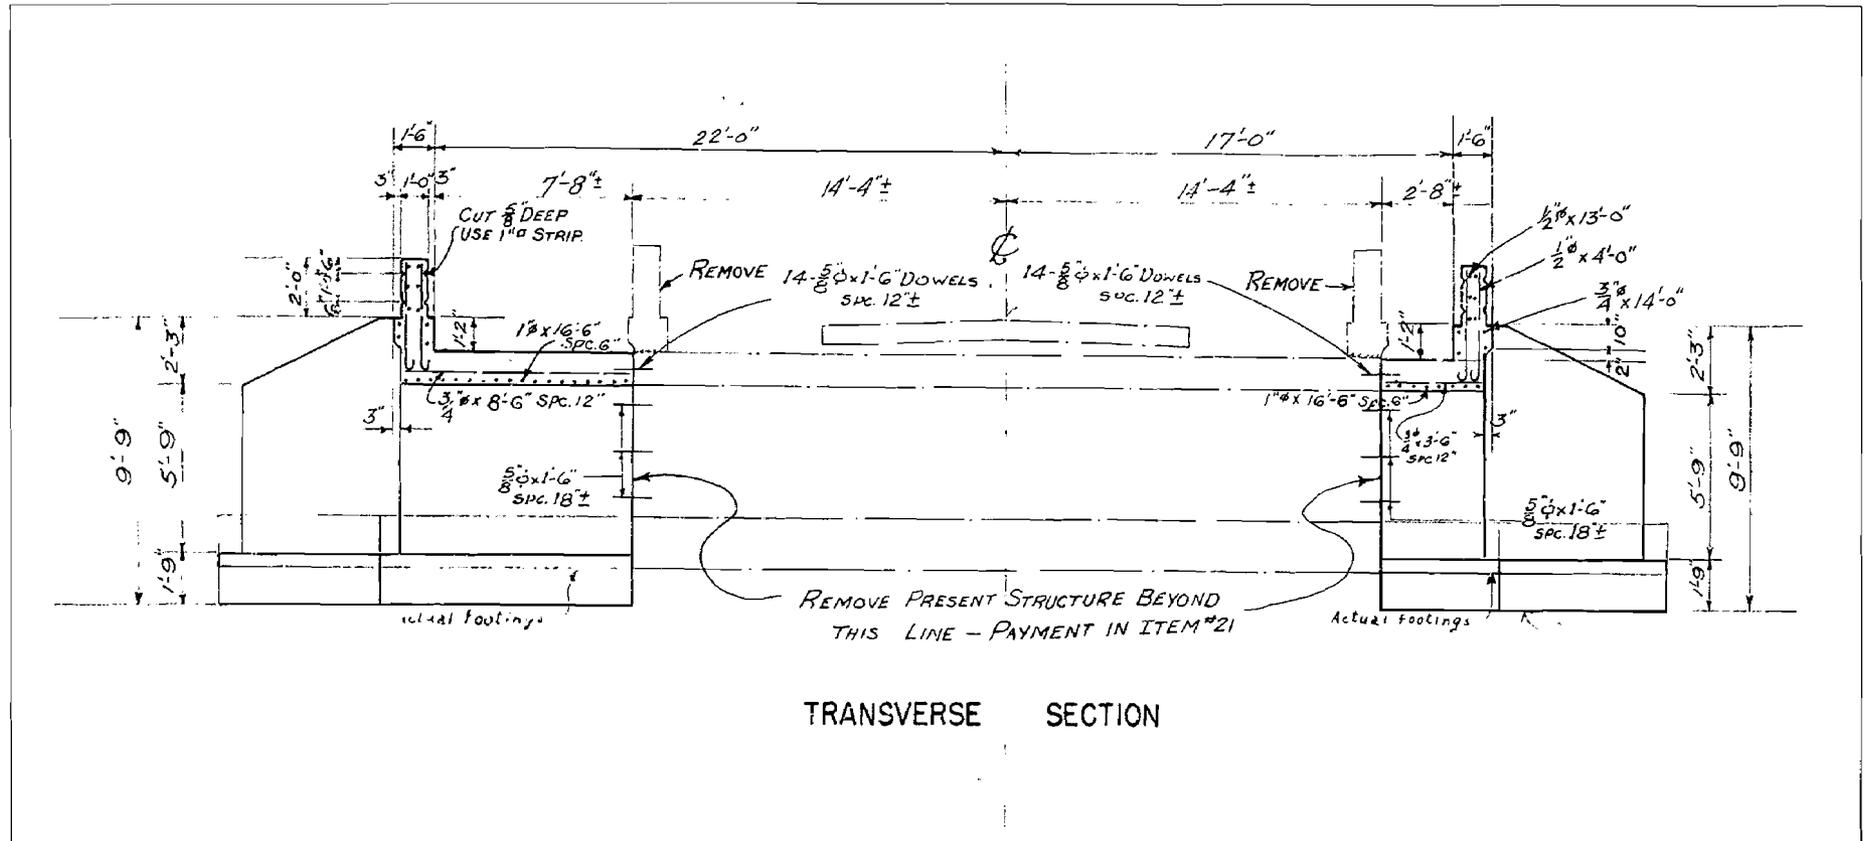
Bridge 447 Reconstruction, Transverse Section View
